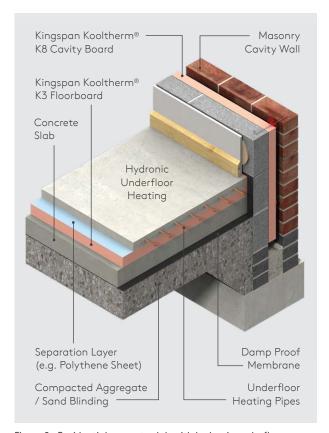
Residential concrete slab with hydronic underfloor heating on ground floor with Kooltherm® K3 Floorboard over the floor slab.
